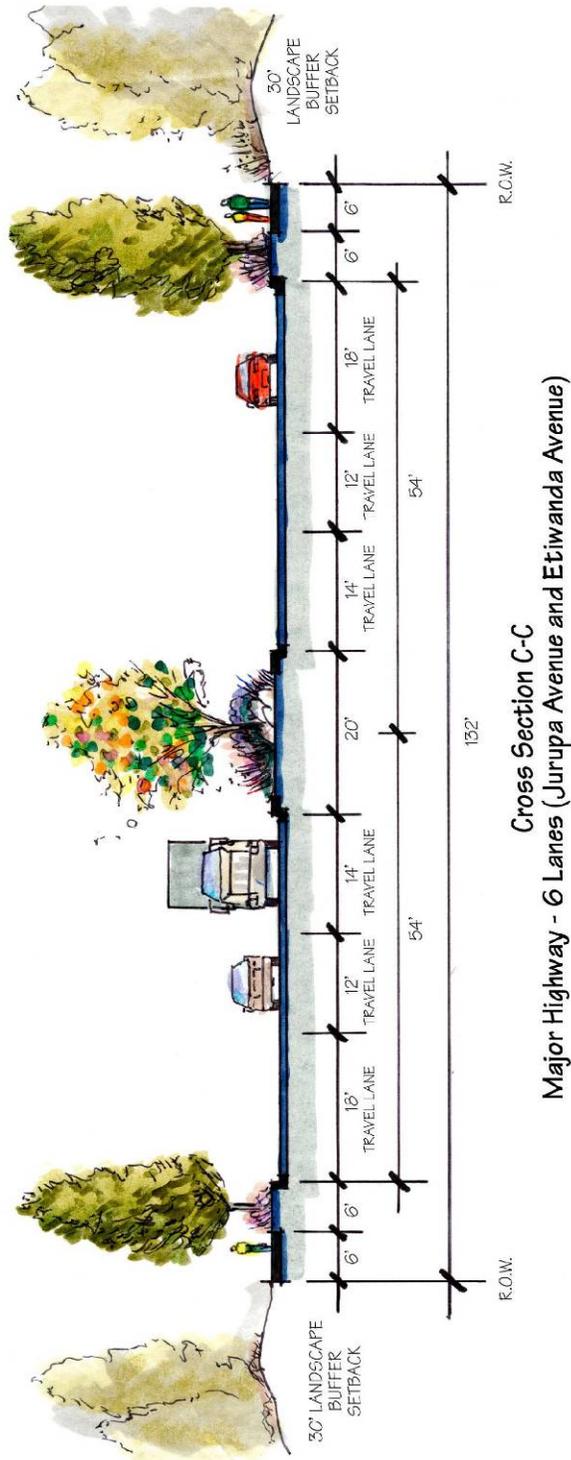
Major Highway – 6 Lanes – Cross Section C-C
